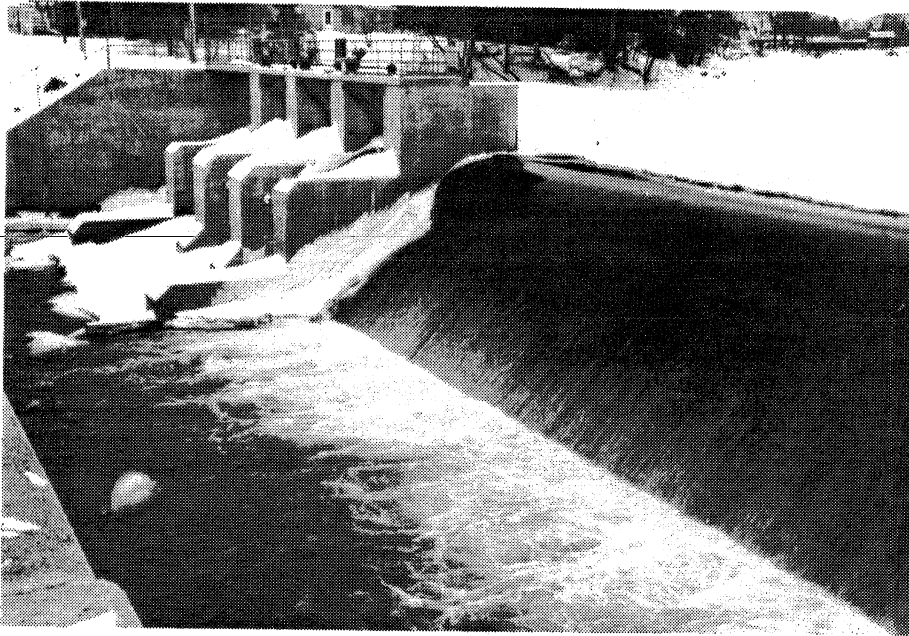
Elk River Dam, January 31, 1986, right bank sampling location.
